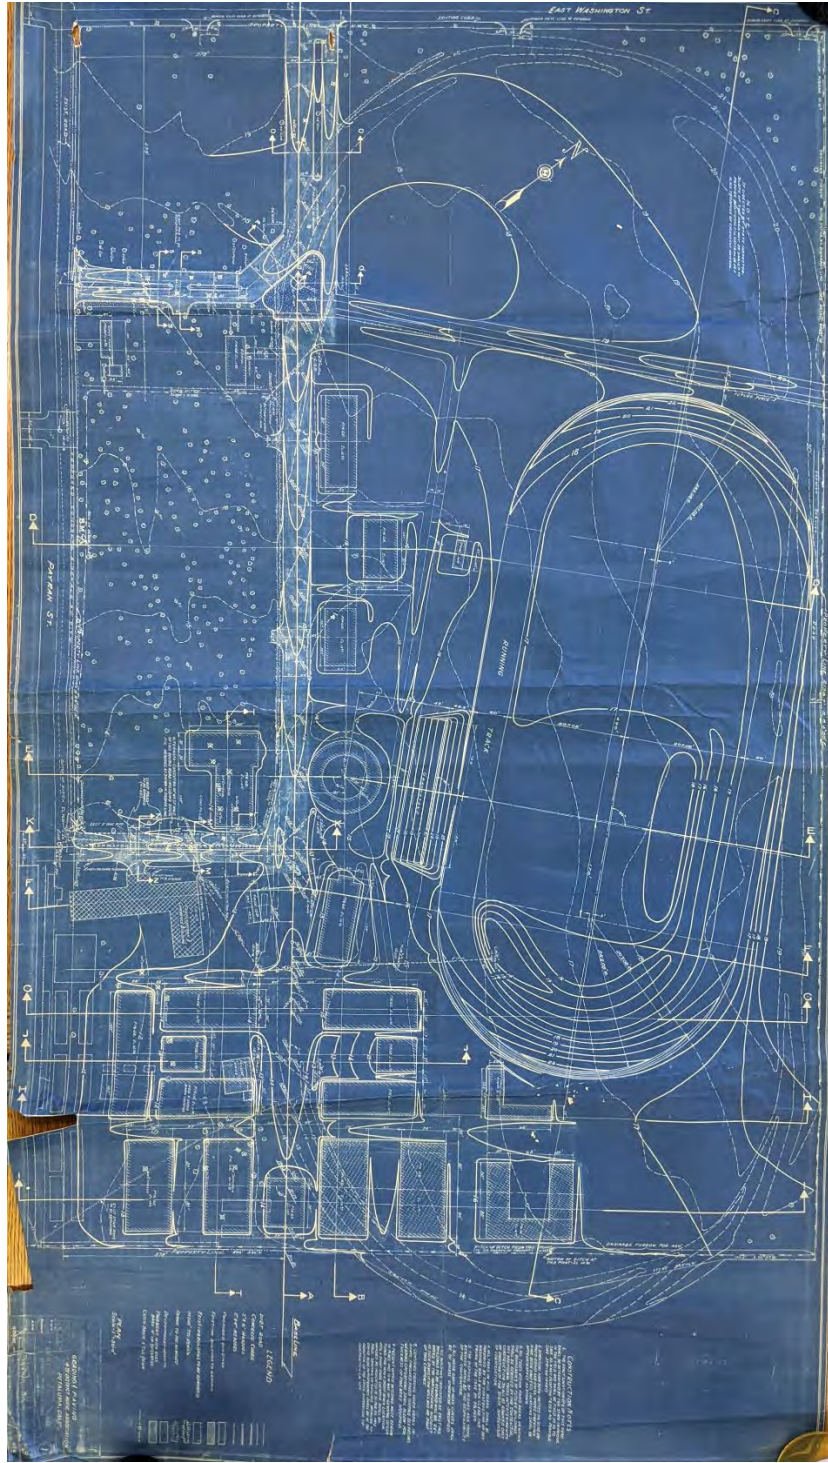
Grading and Paving Plan, State Department of Public Works, Division of Architecture, September 20, 1948. Source: Sonoma-Marín Fair Archives.
